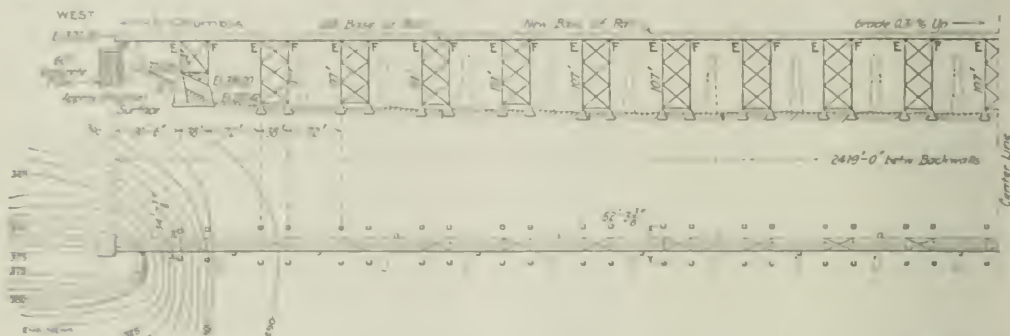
PLAN AND ELEVATION OF THE NEW FARMVILLE
